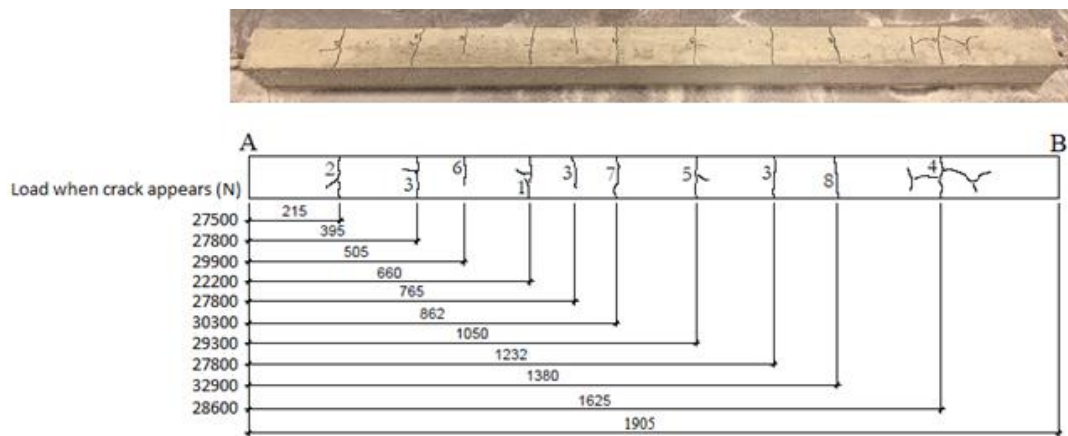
Prism test and crack pattern: #4 steel – specimen 1.
